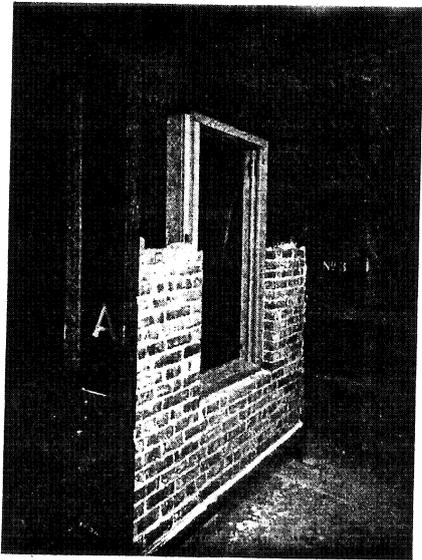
BOX FRAME IN MASONRY WALL TESTED FOR FRAME LEAKAGE
